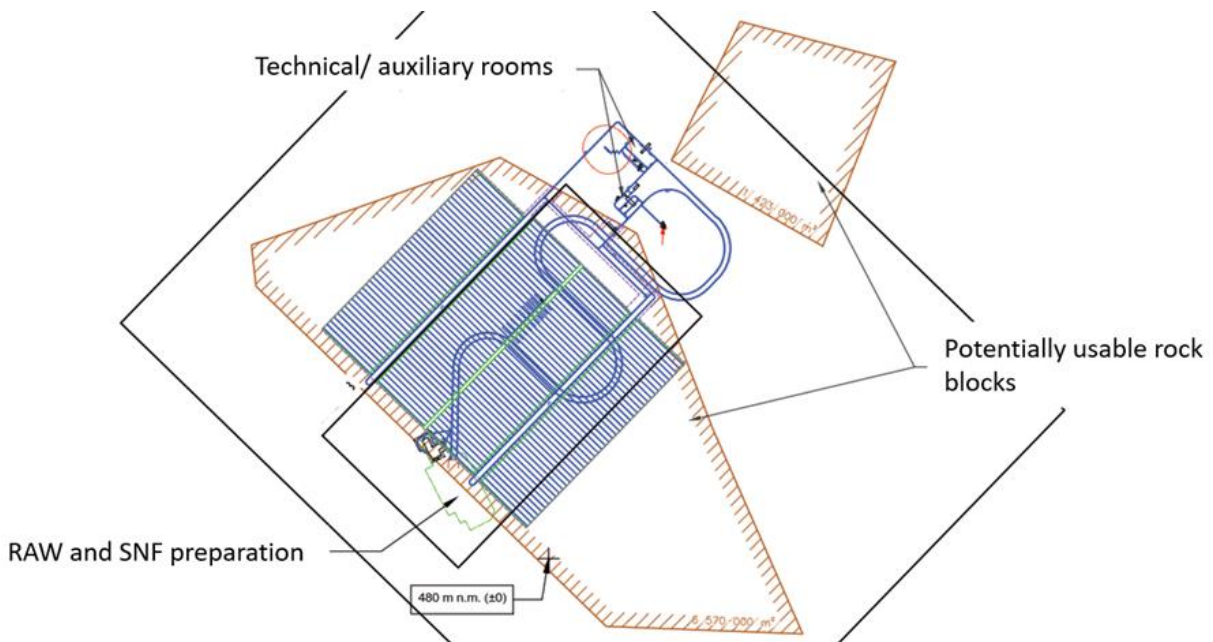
Vertical disposal, prevailing conventional drill and blast method (D2 - VD, C) (Spinka et al. 2018).
